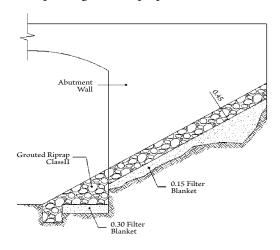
Typical section of grouted riprap over filter blanket for embankment repair.
